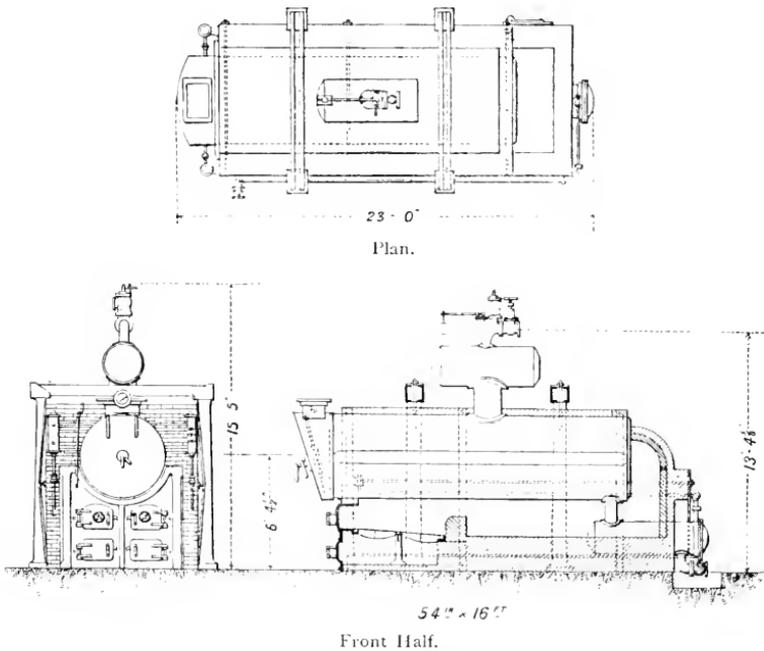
SETTING OF STANDARD MULTITUBULAR BOILER.
